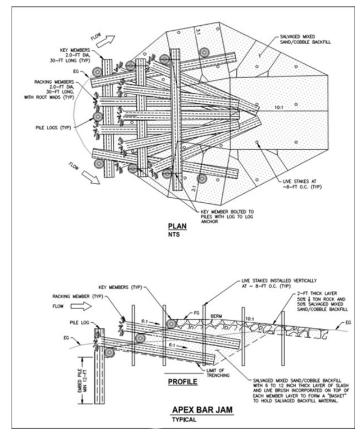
Construction details of a typical apex bar jam (Michael Love & Associates 2016).
